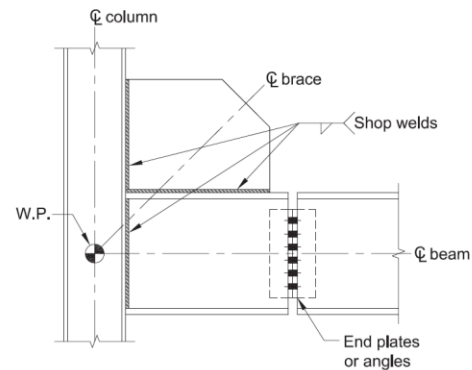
Beam-to-column connection that allows rotation (Thornton and Muir, 2008).
